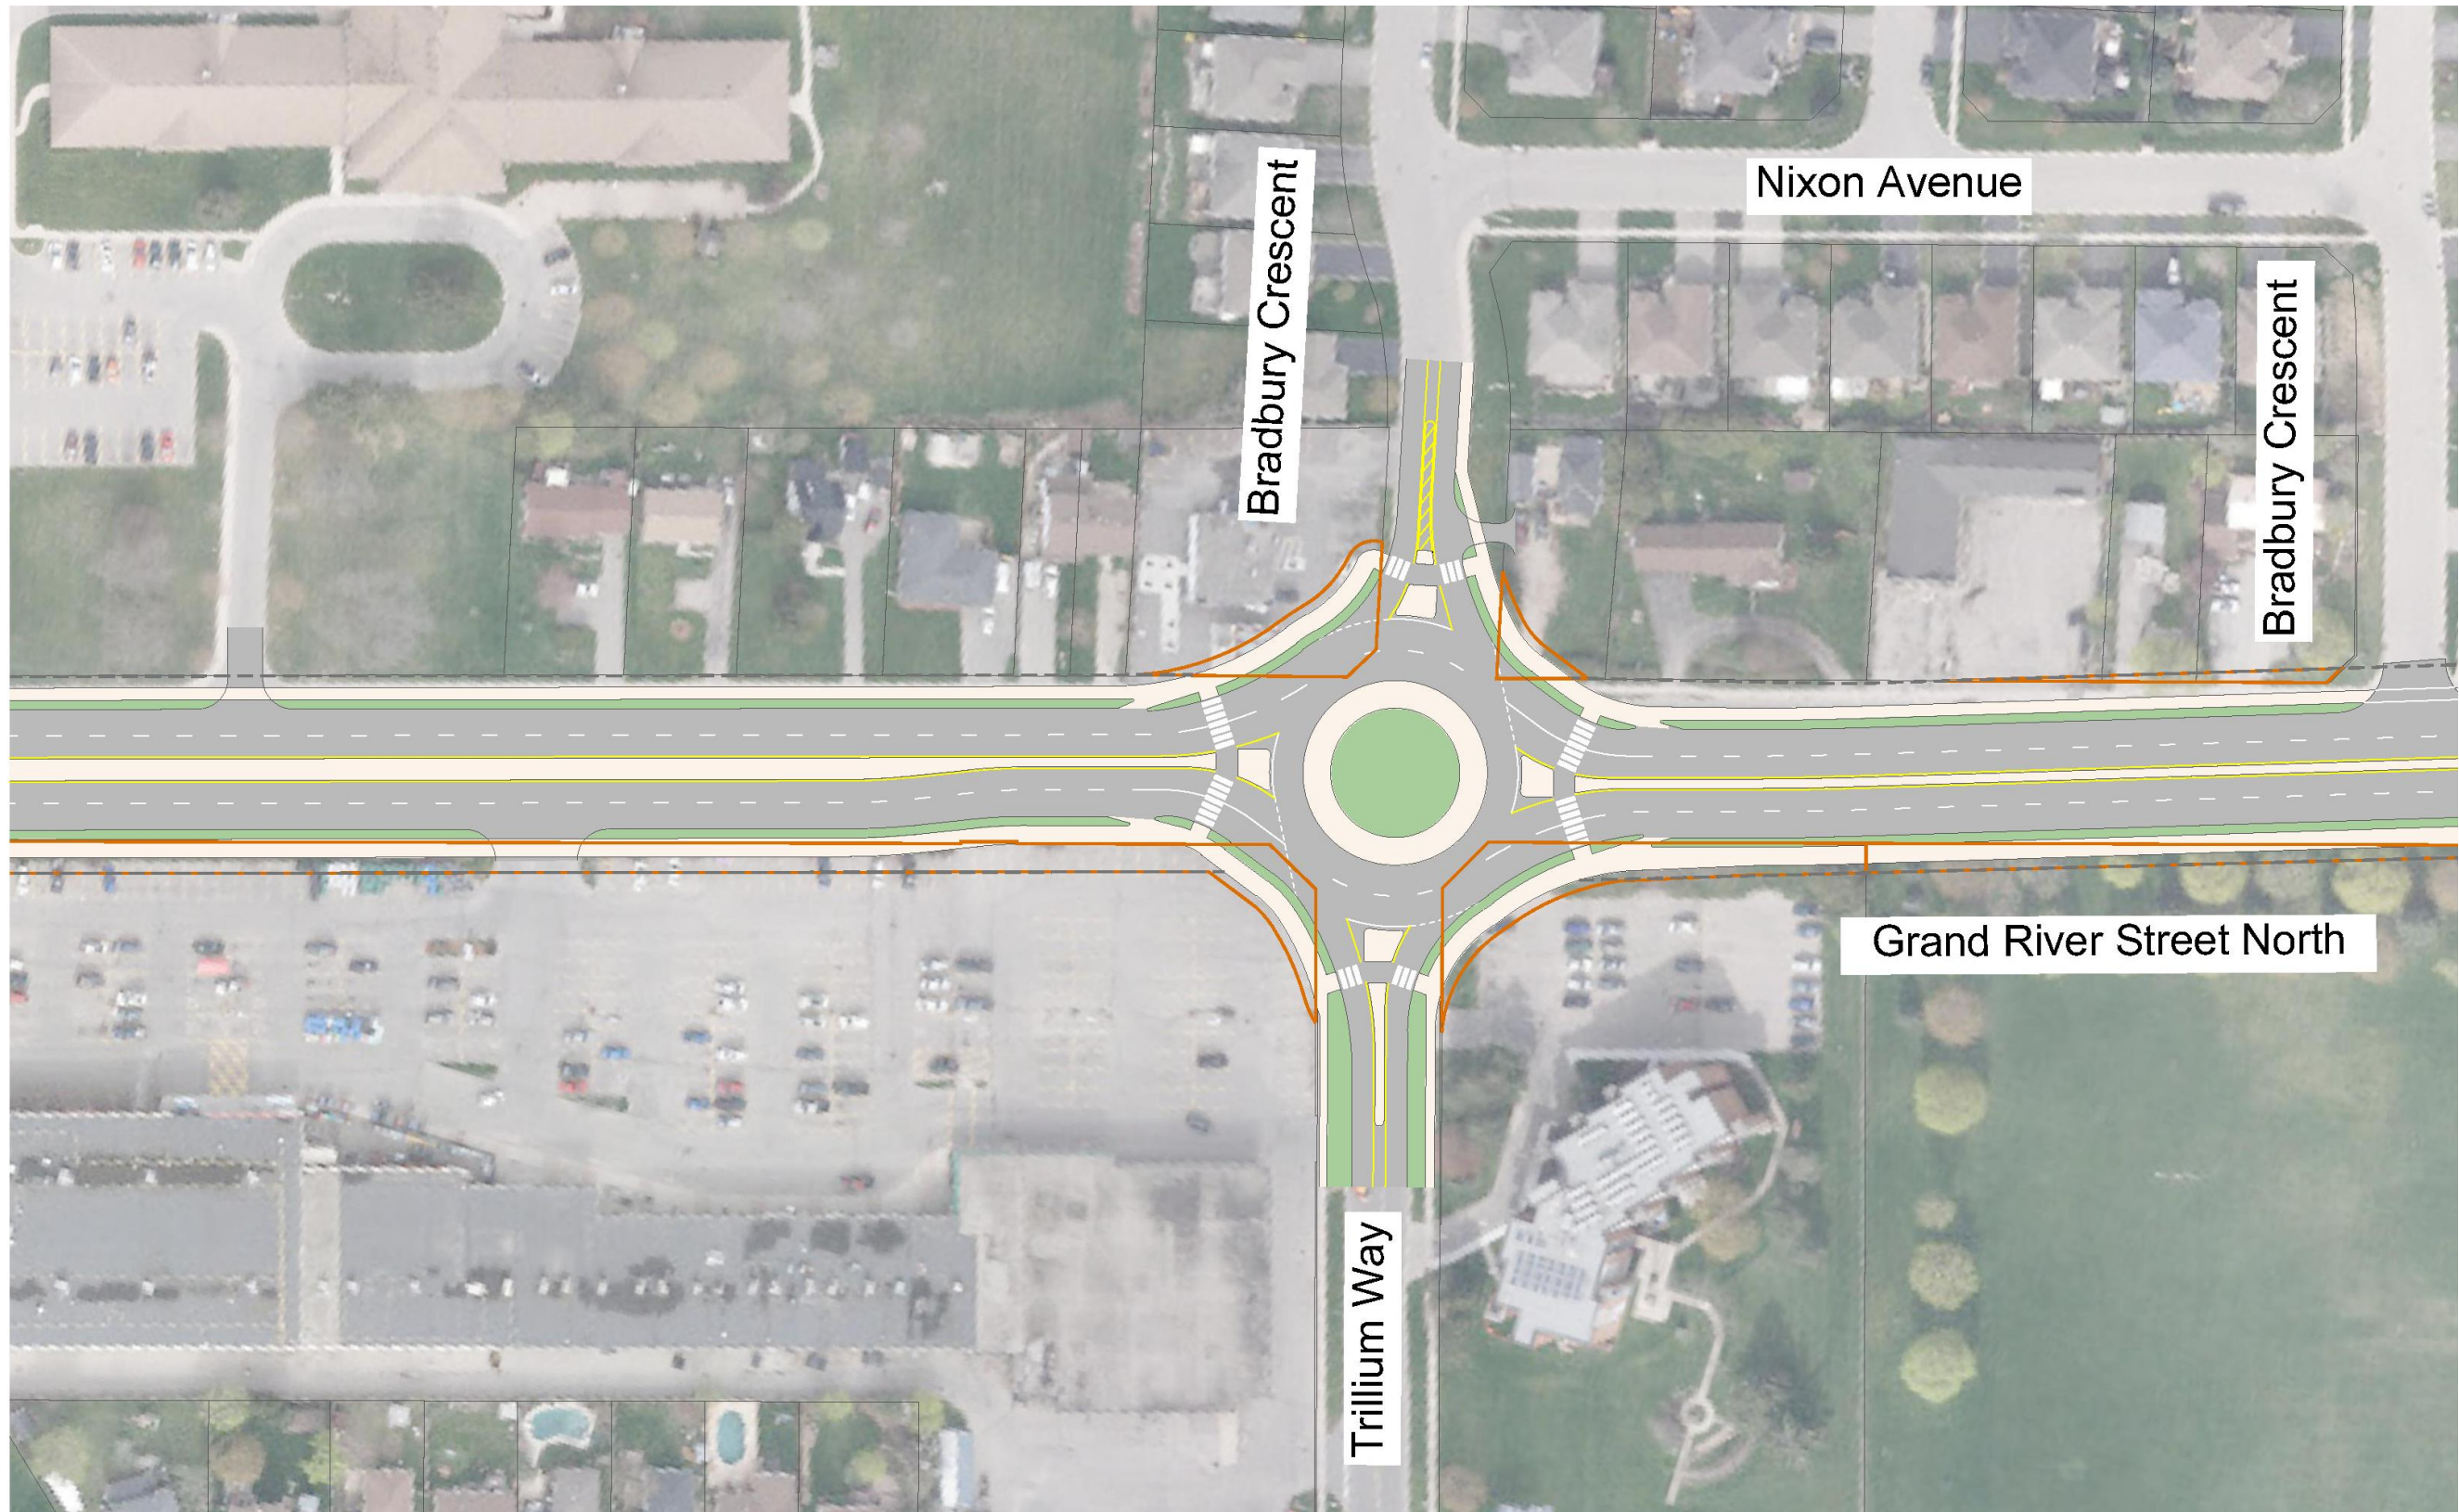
TPA Grand River Street North at Trillium Way/Bradbury Crescent Intersection
